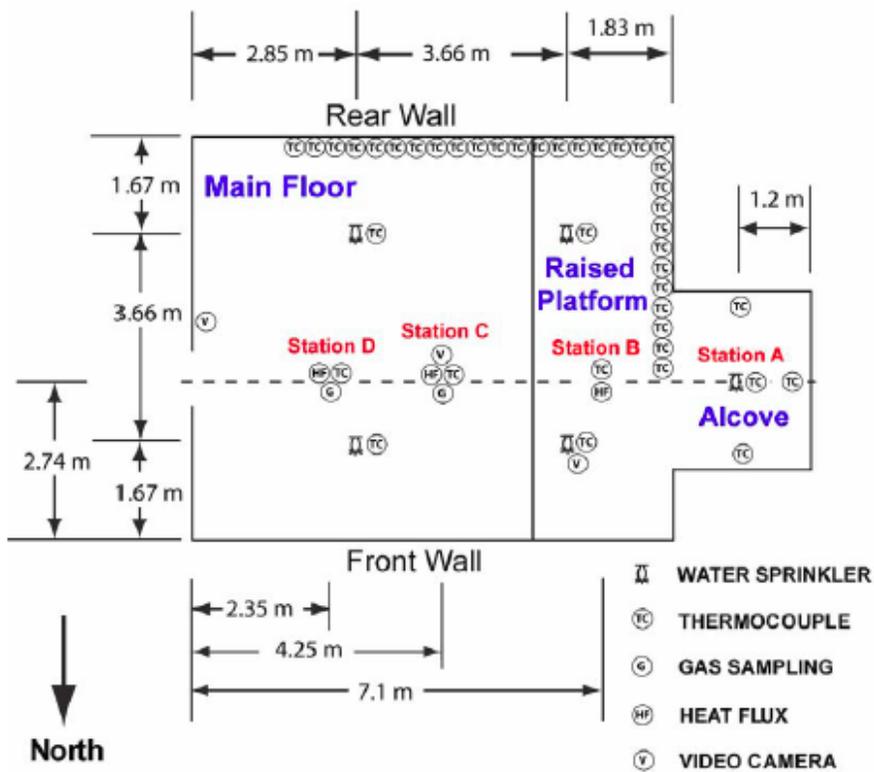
Public assembly occupancy plan view and instrumentation locations.
